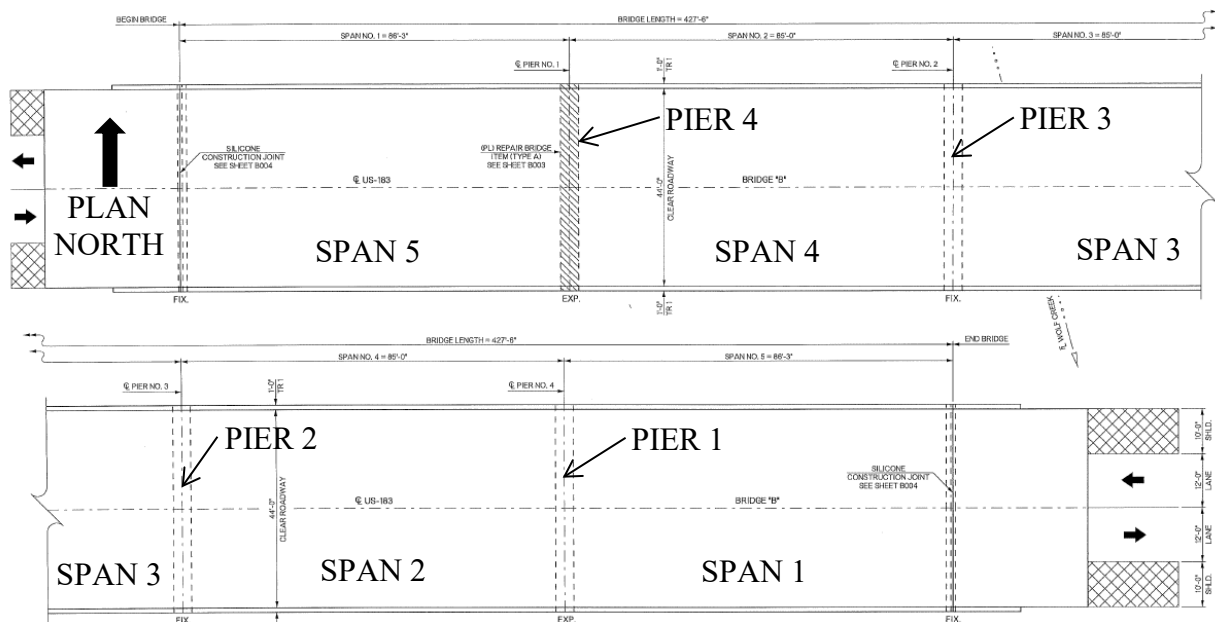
Plan view of U.S. 183/412 over Wolf Creek bridge
